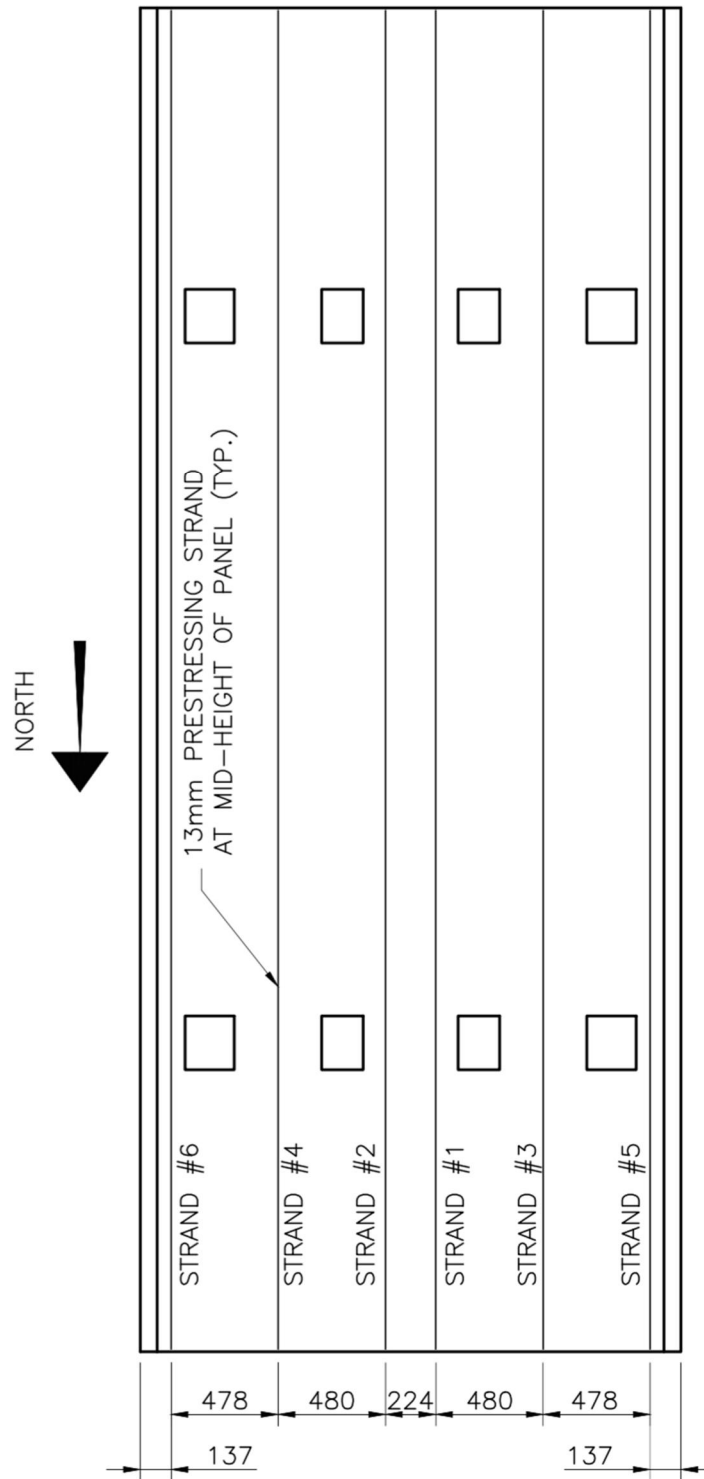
Typical PPCP Prestressing Steel Layout (Plan View)
